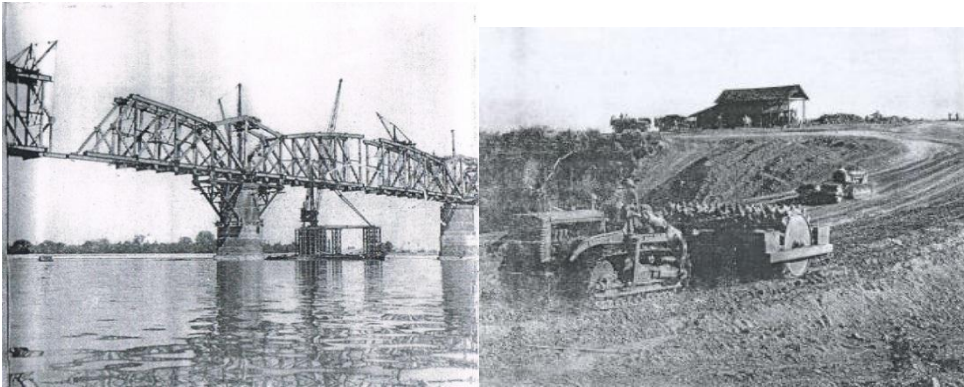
Inwa Bridge Under Reconstruction Figure 3. Mechanized Road Construction, Mingaladon, Yangon
